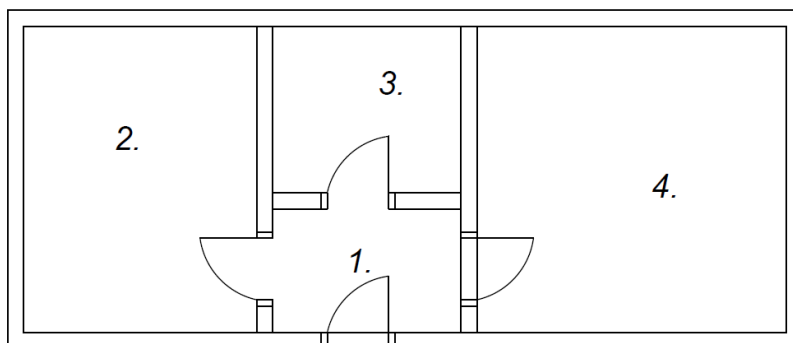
Ground plan of the traditional house in Zagorje. Drawing by: Authors
